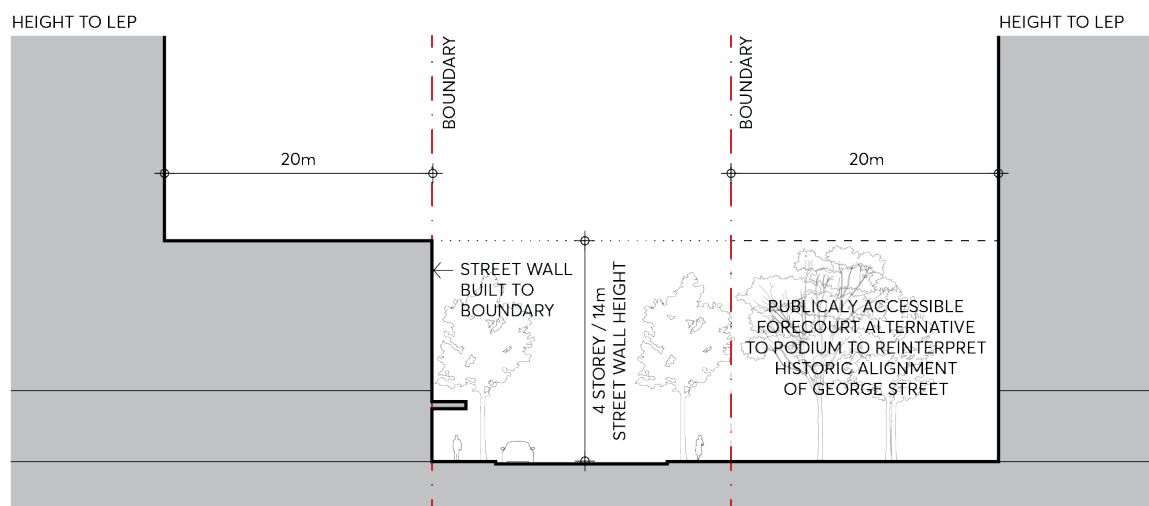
George Street west of Marsden Street – Street Wall Height and Building Setbacks
